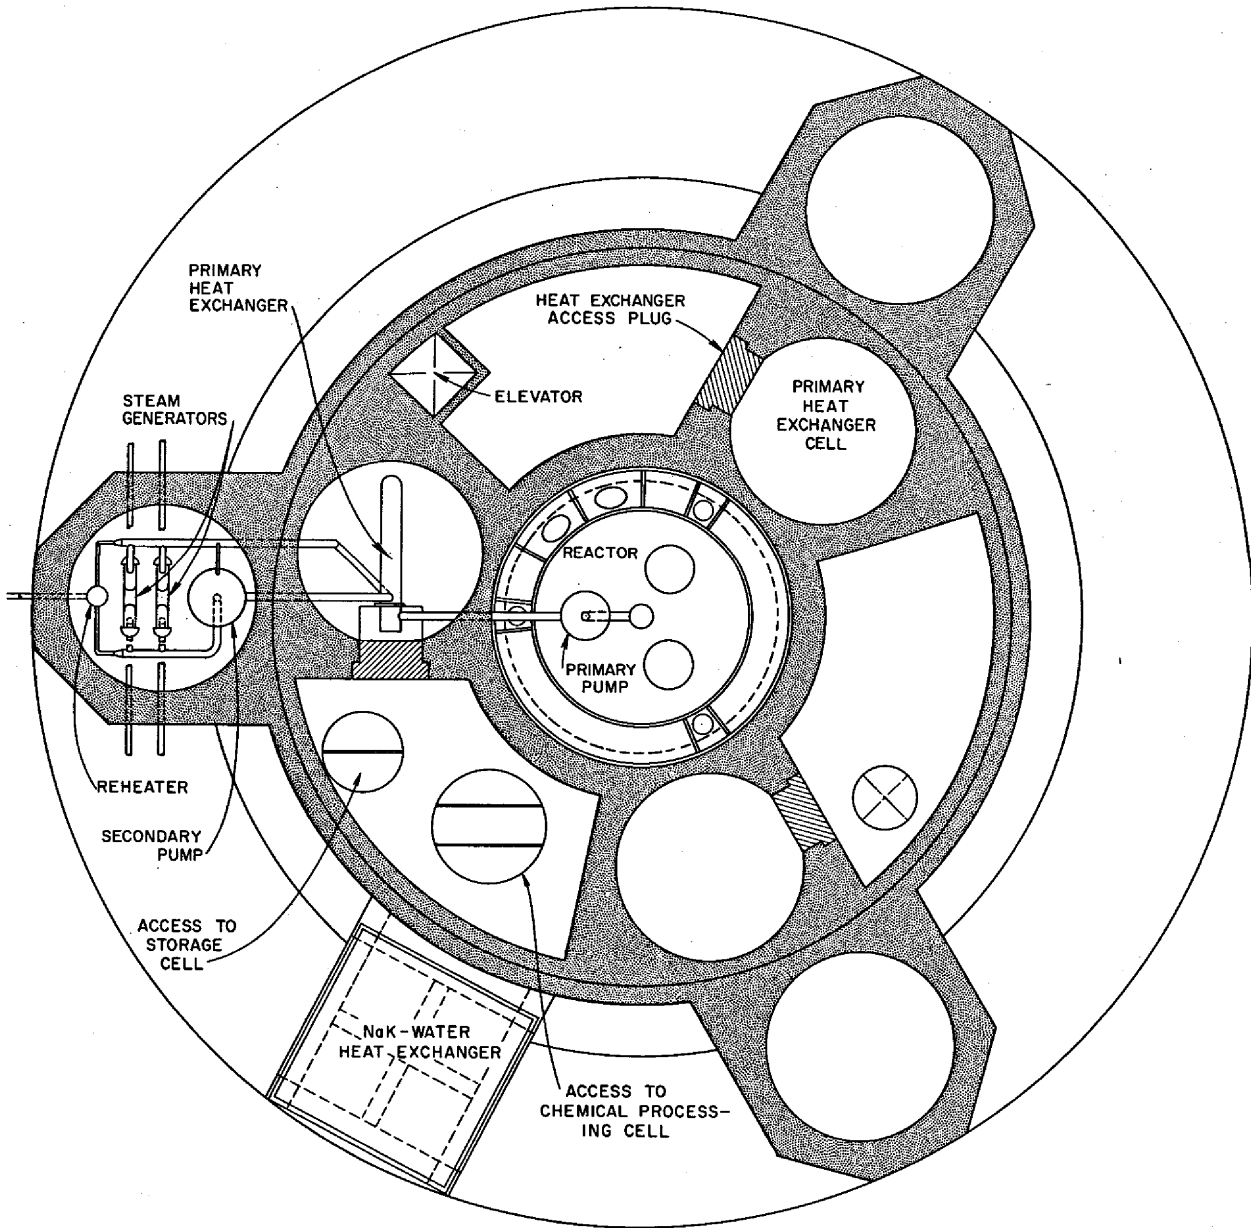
Plan View, Fourth Floor of Confinement Building, Section DD.
